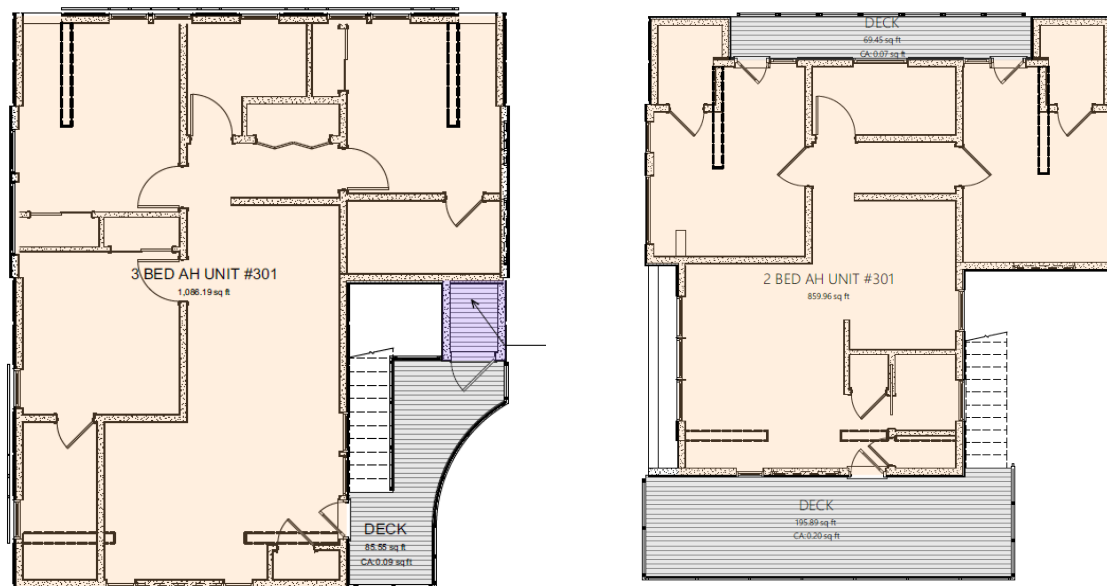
&3: Comparison of third floor plan changes: plan at left was presented in January, and plan at right is revised proposal.
